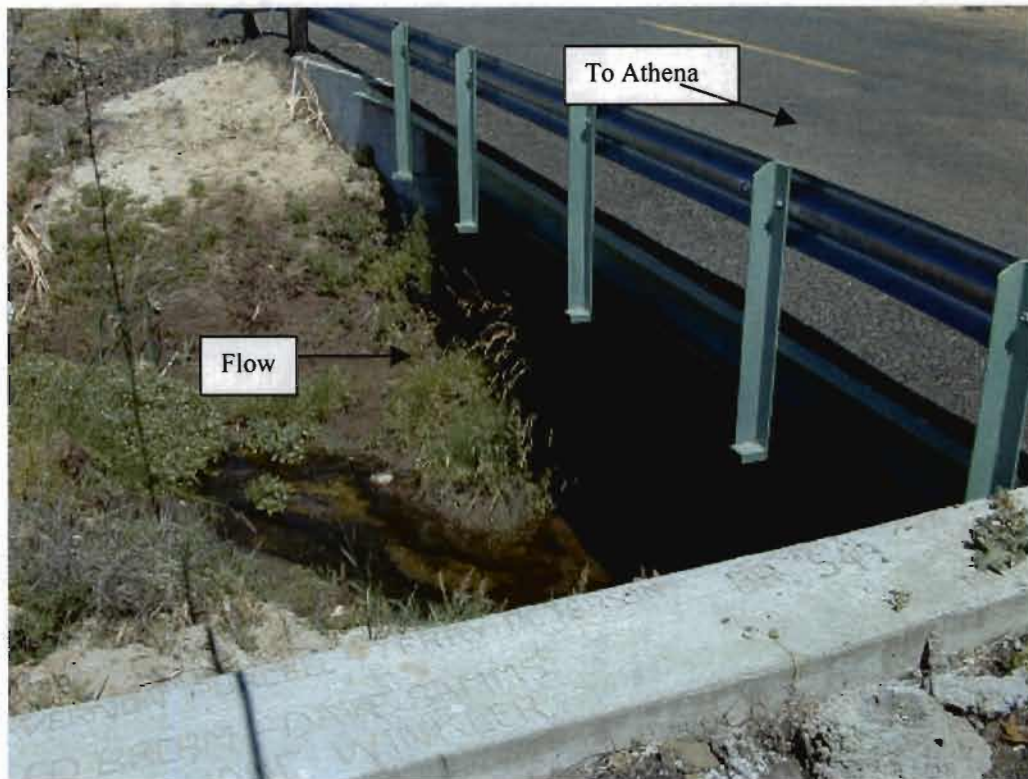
View looks at upstream face of bridge over Waterman Creek/Gulch north of town.
